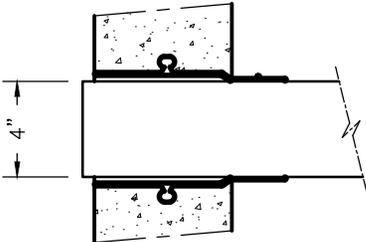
DOUBLE INLET & OUTLET DETAIL
